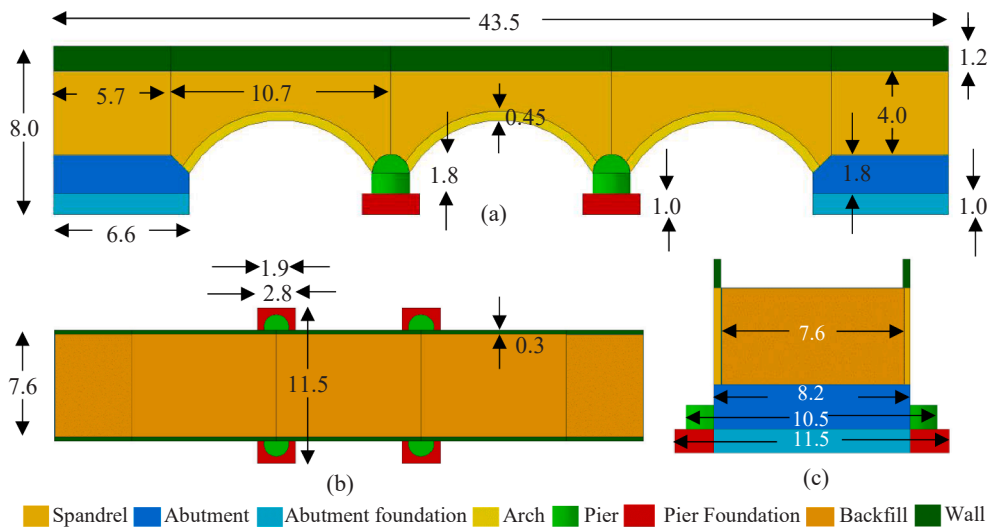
Geometrical details of Nith bridge; (a) lateral/side view, (b) top view, and (c) cross section at abutment (units are in meters).
